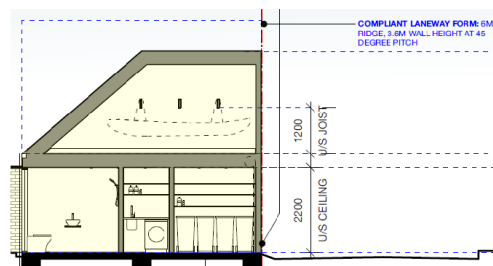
SECTION A- SHOWING REDUCED BULK AND SCALE OF THE PROPOSED OUTBUILDING WITH A GABLED FRONT AND HIPPED REAR ROOF FORM
